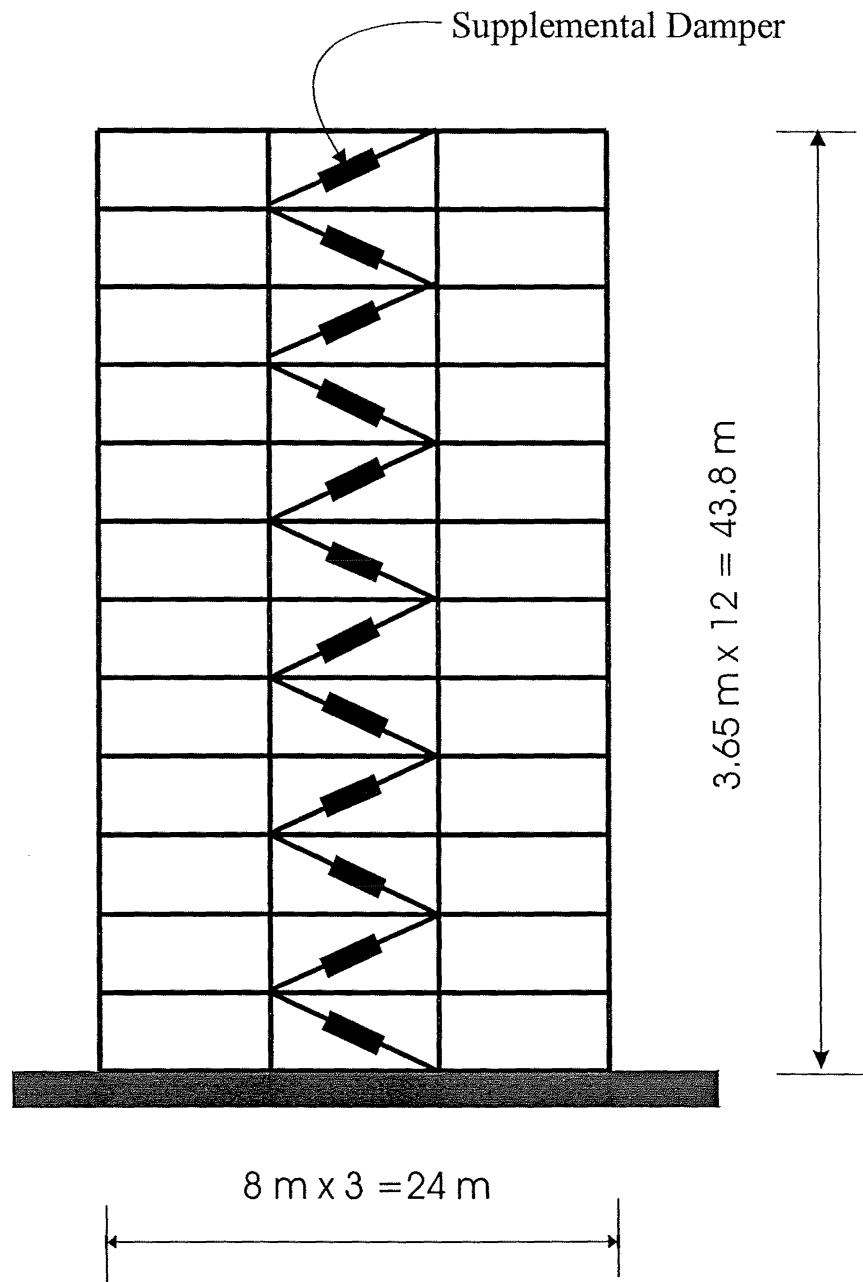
A 12-storey 3-bay Reinforced Concrete Frame Structure with the Supplemental Dampers
